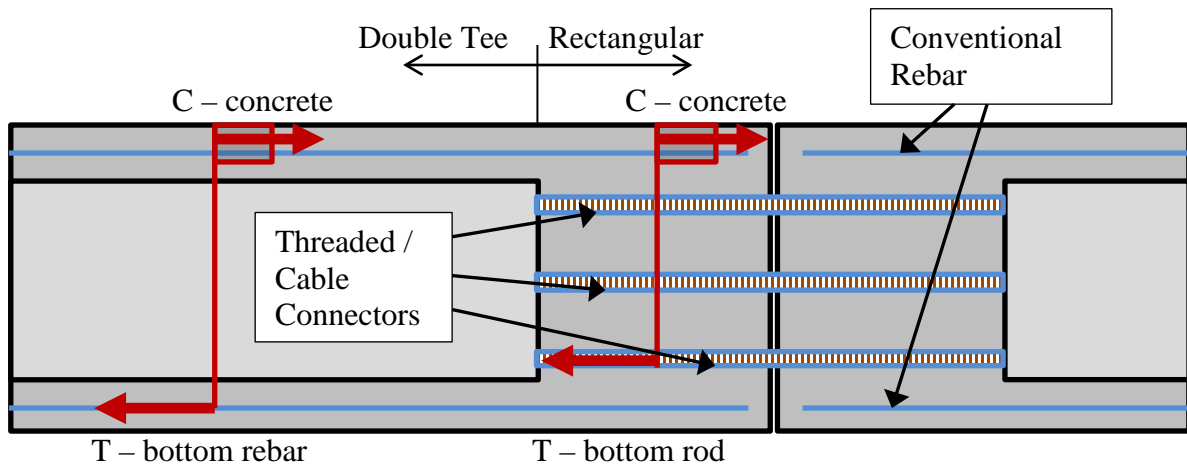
Cable / Rod and Reinforcement Forces at Connection
